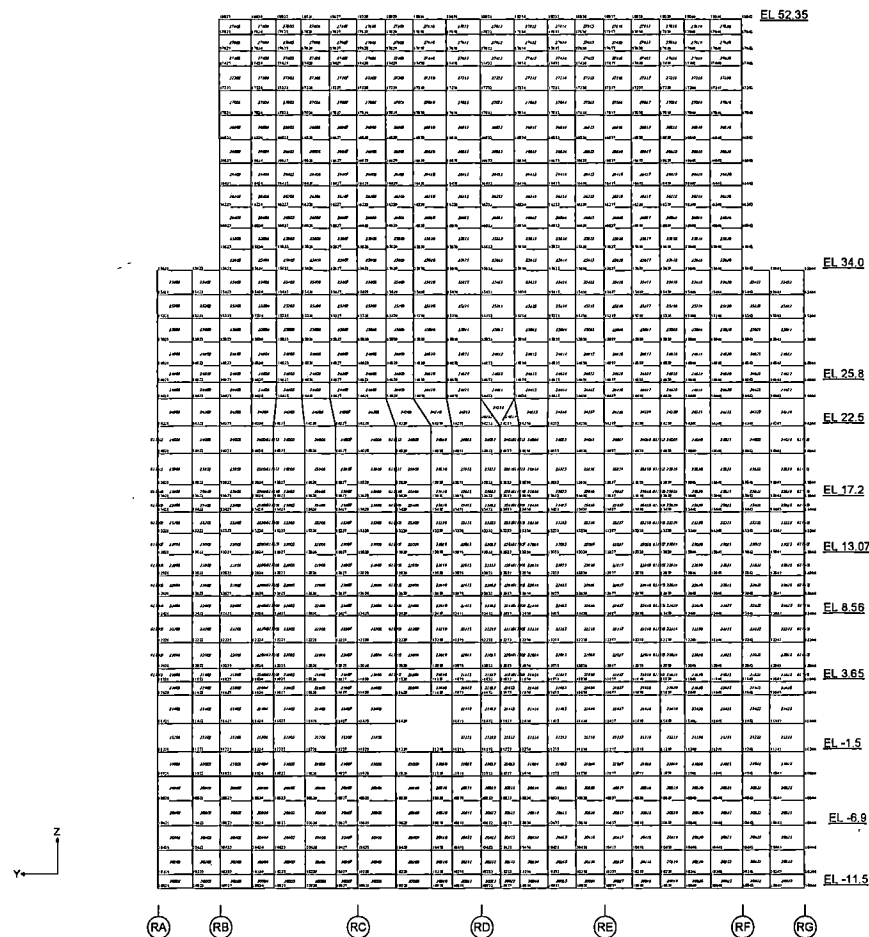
FE Model of the External Wall (R7/F1 Column Line)
